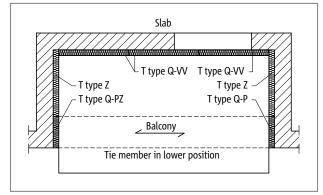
Schöck Isokorb® T type Q-VV, Q-P,, Q-Z Recessed balcony supported on three sides with tie member
